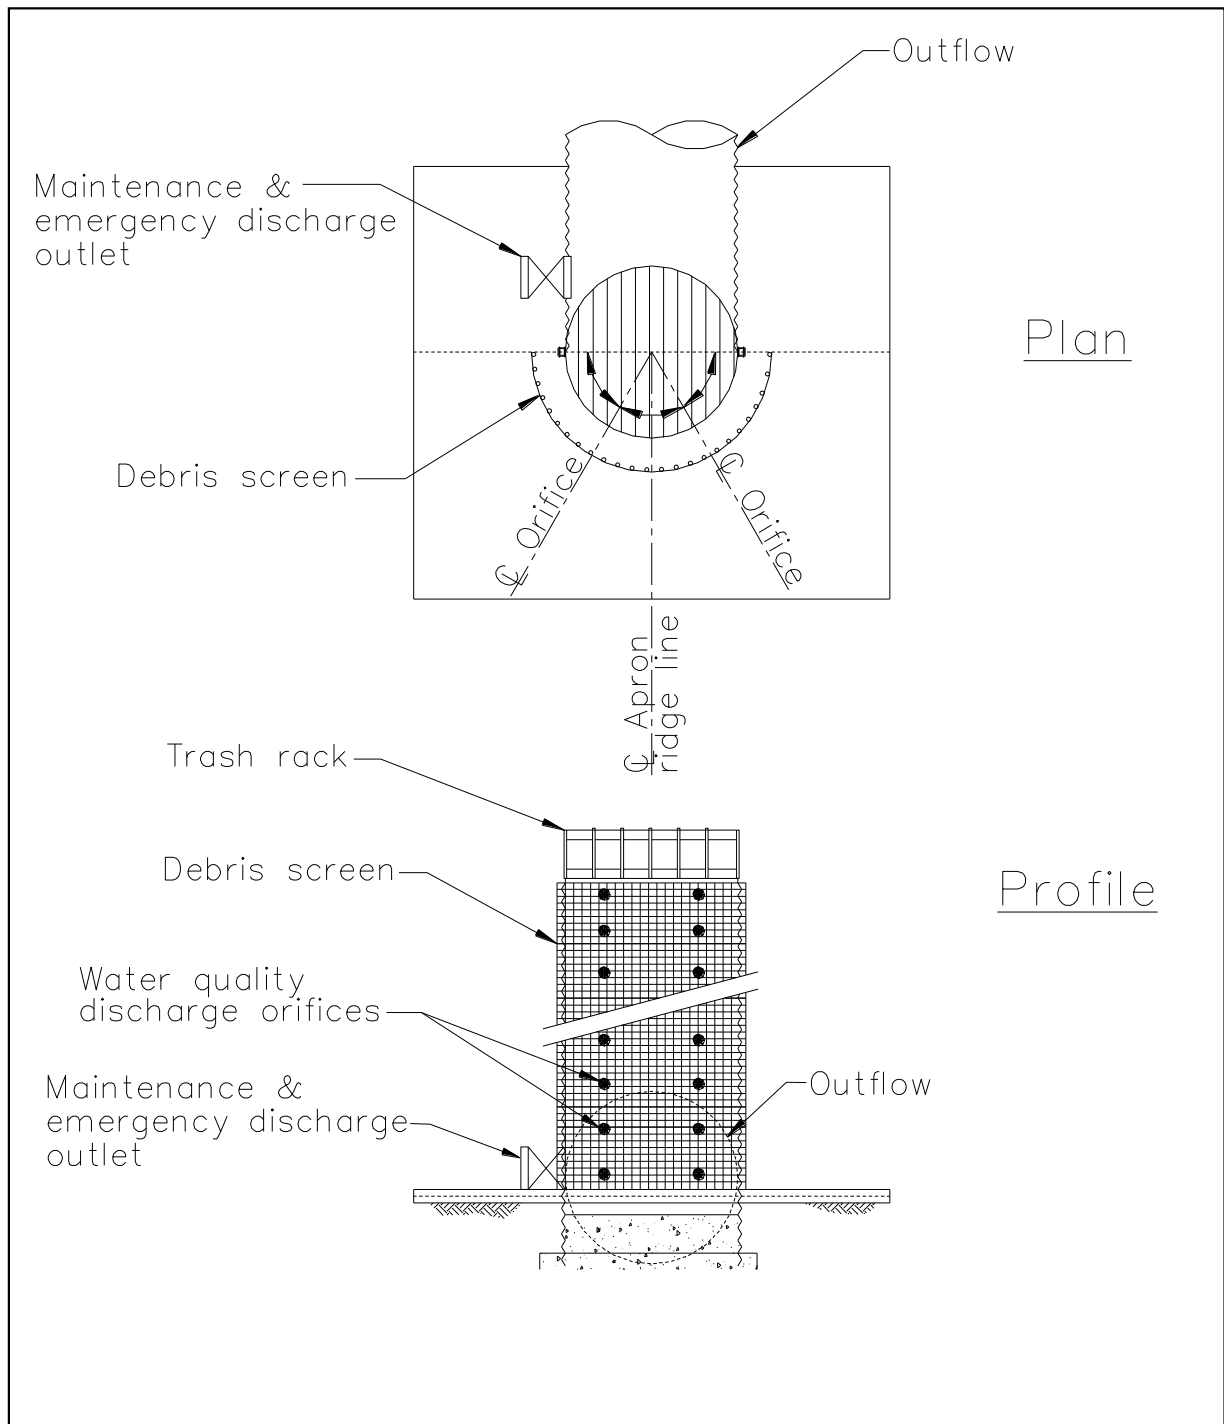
MULTIPLE ORIFICE OUTLET RISER
